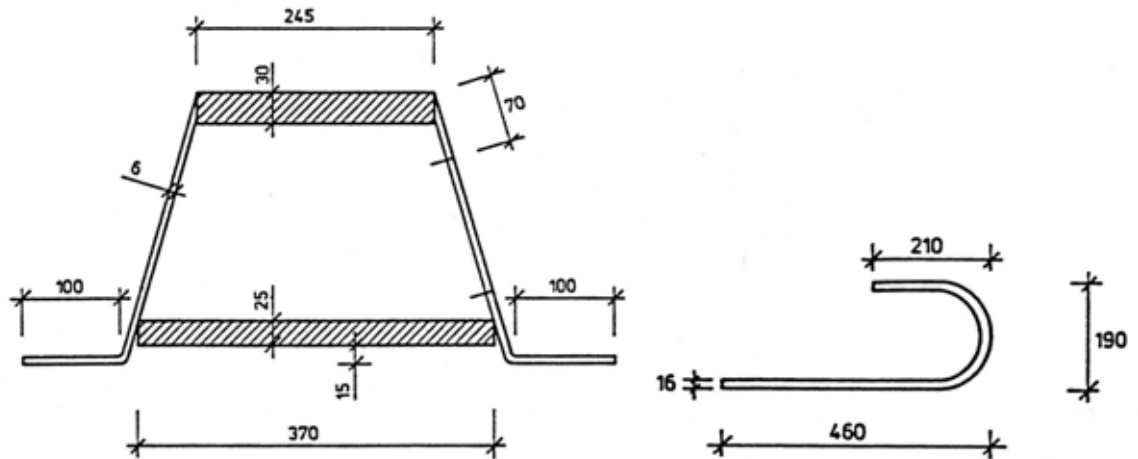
Middle beam. Cross-section and tie reinforcement (hooks made of rebars T16) for anchoring of slabs to the beam. Depth of beam = 265 mm + 6 mm.
